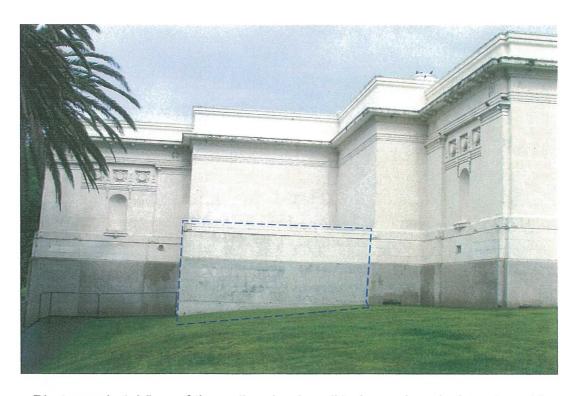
The ground beside both front corners of the gallery (under grass and tarseal) will be affected by the construction of ramps and associated works.
